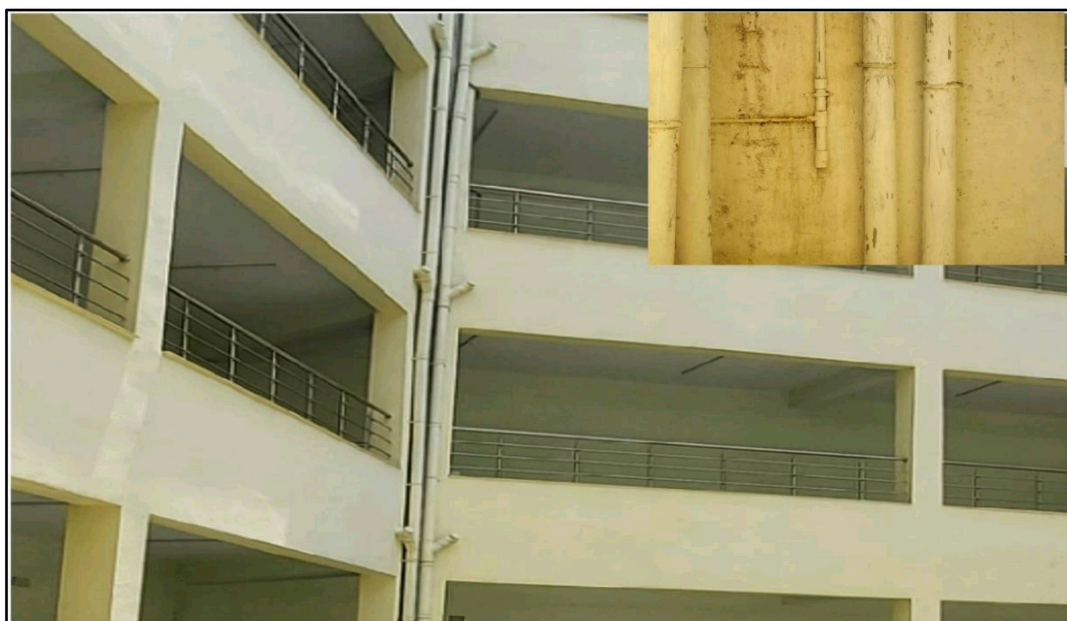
Dual Piping System Installed at Science Building, Cheri- Manatu Campus
